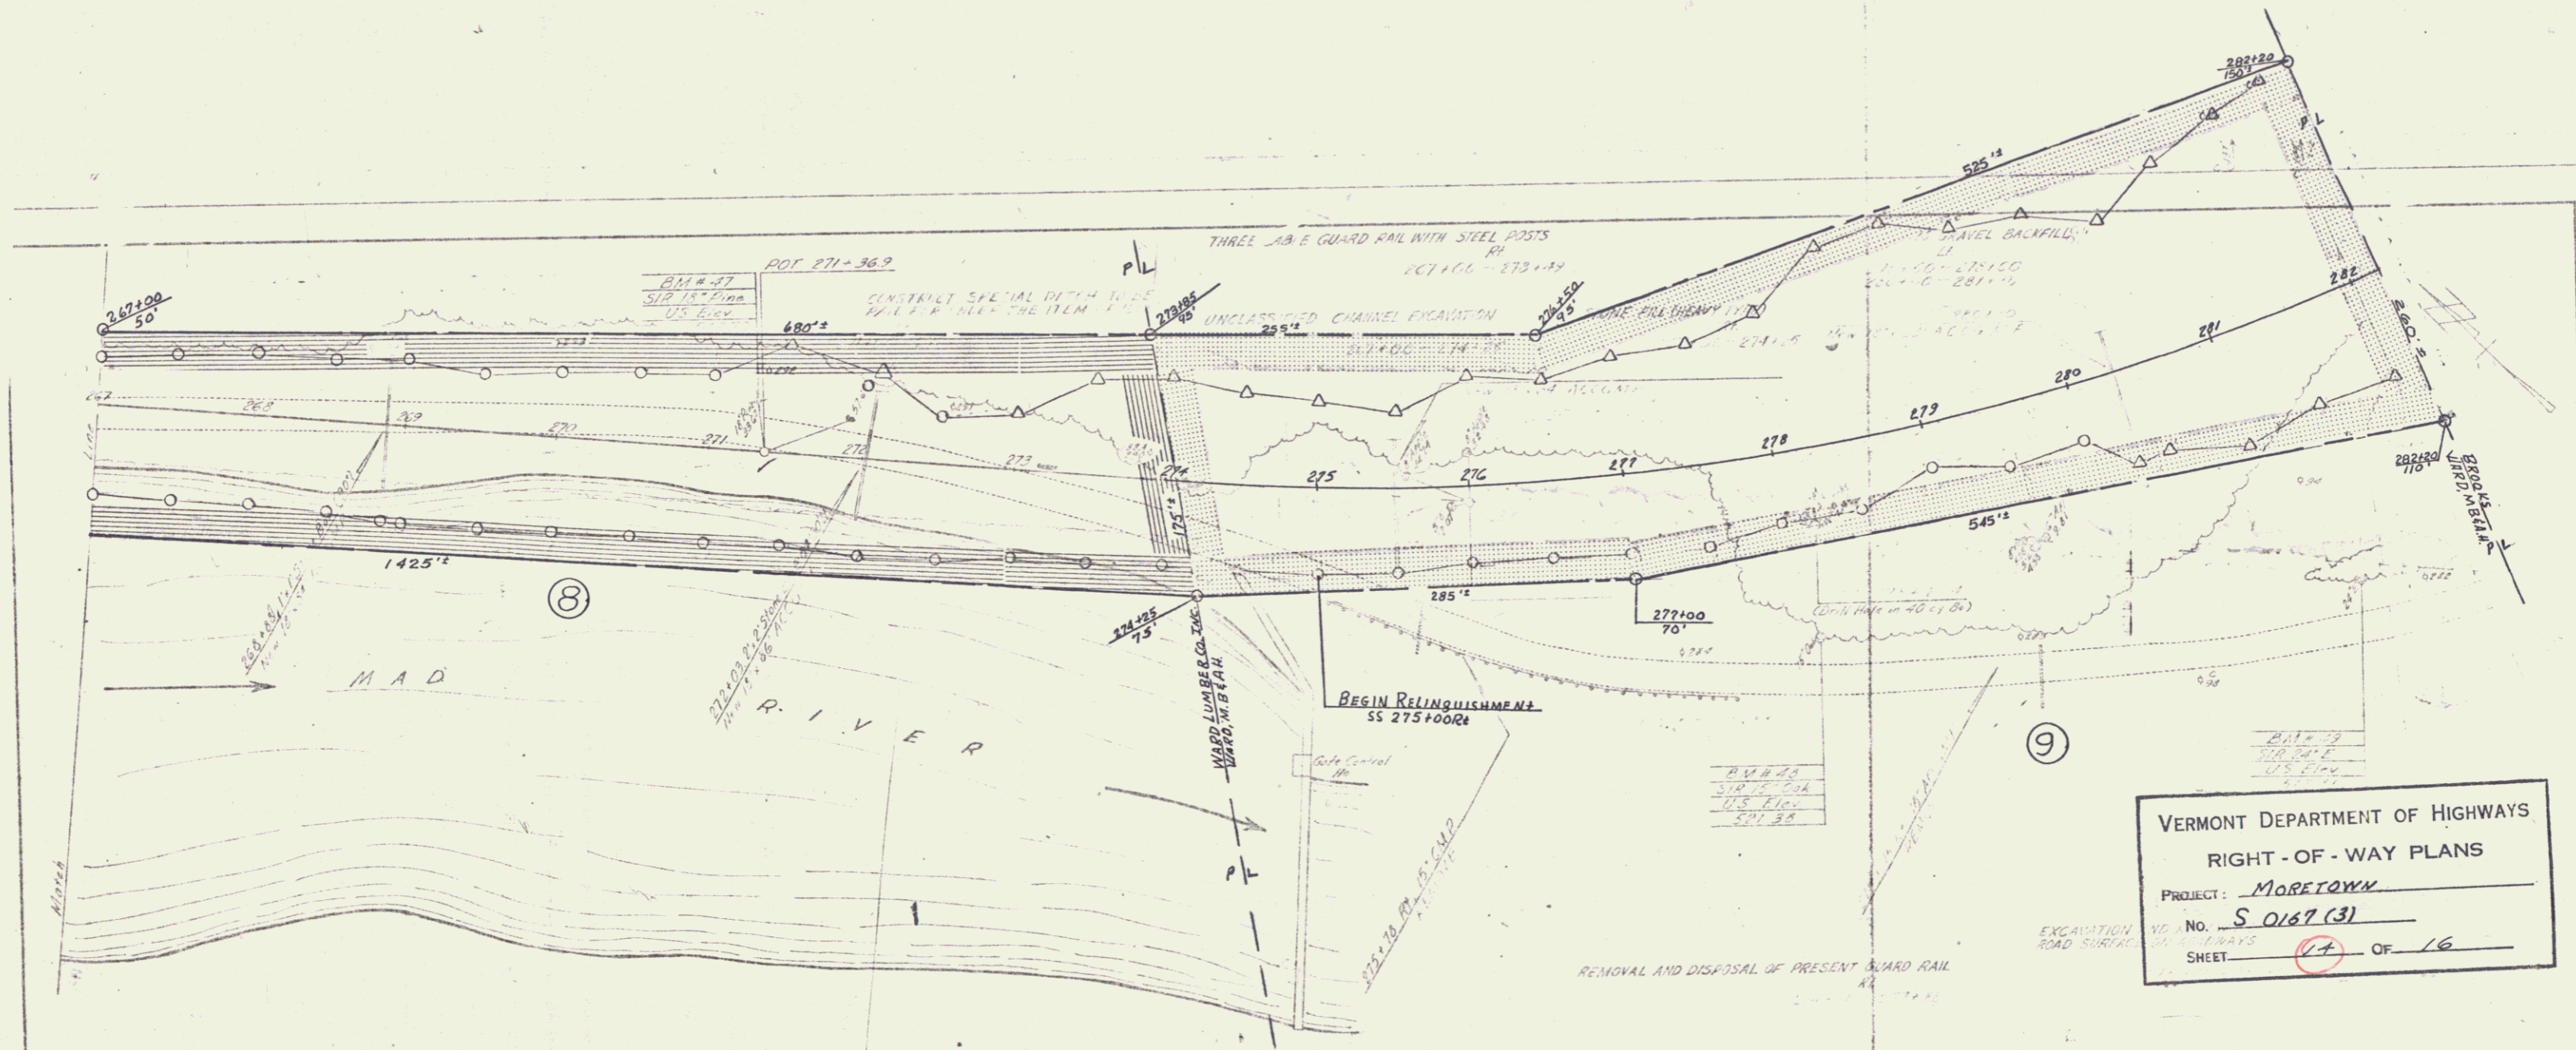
PLAN - PROFILE - P. & R. E. DRAWINGS
